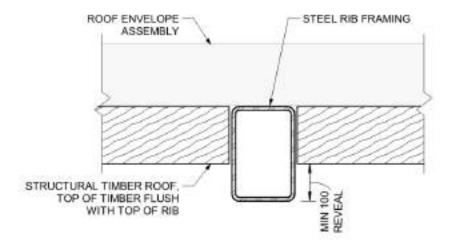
C: Misericordia Station Timber Roof Deck
